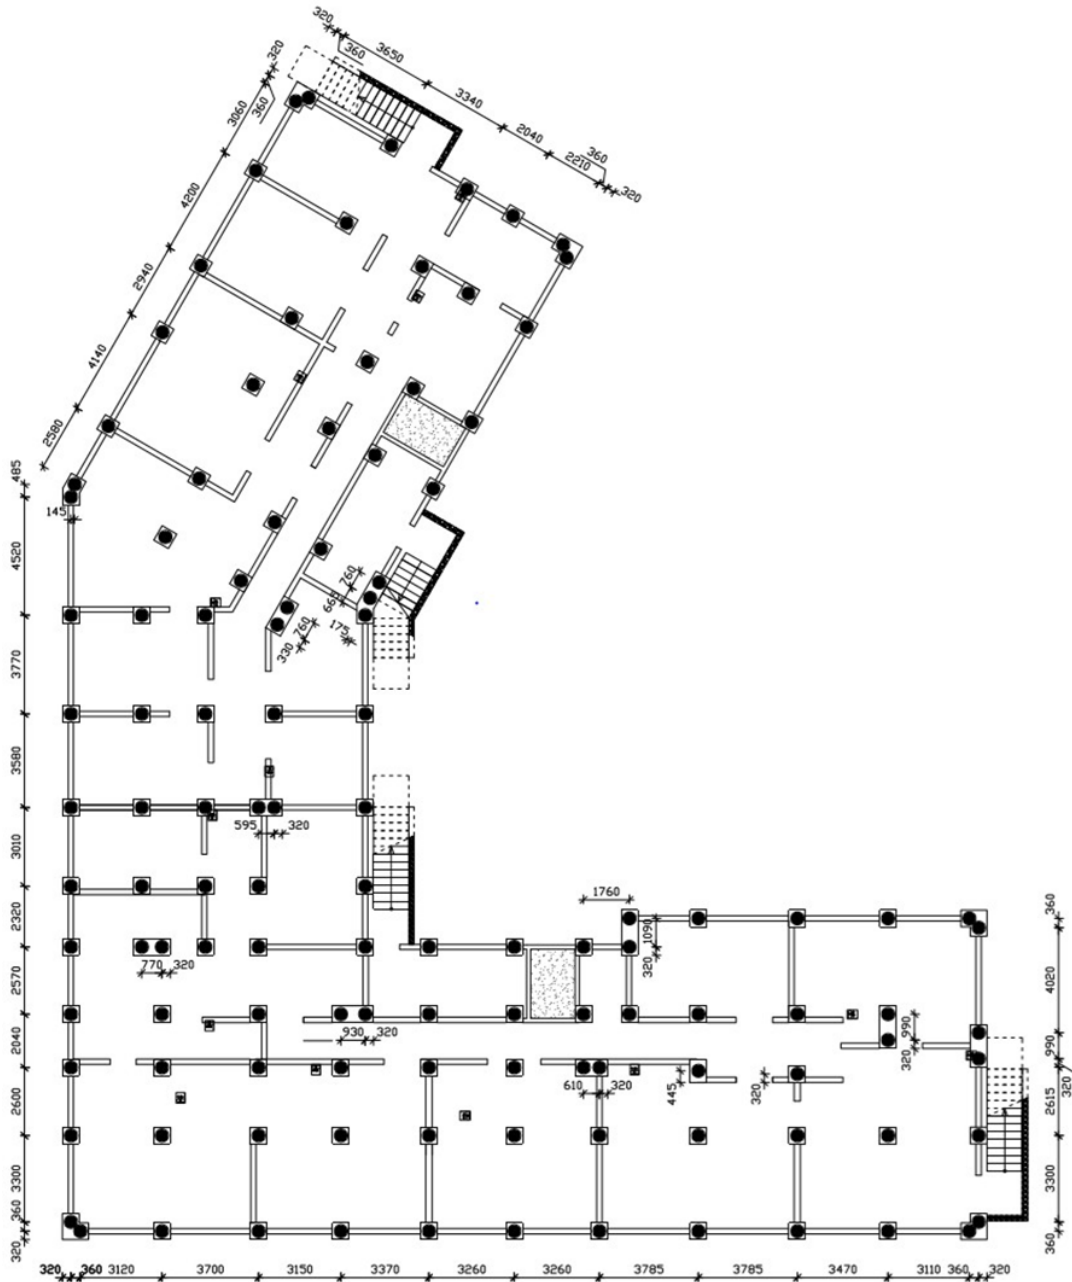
Plan of location of SILRSBs on the lower pedestals in the basement of the 7-story apartment building “Stepanakert-Sections-4-5” with R/C monolithic load-bearing walls
